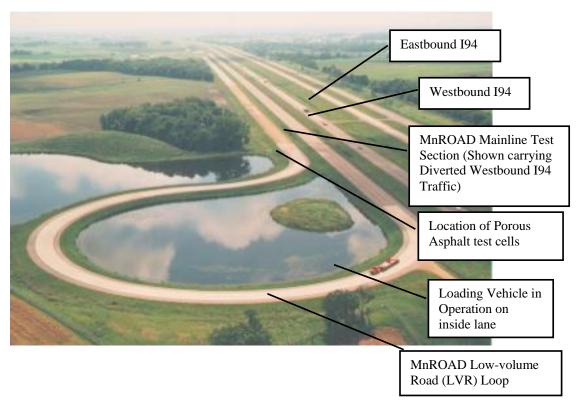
MnROAD mainline and low-volume road aerial photo
